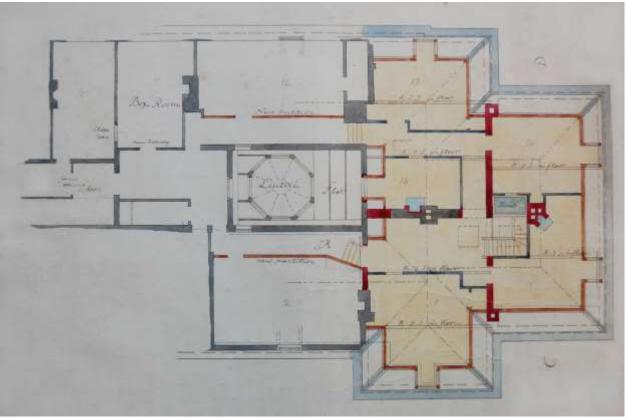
The 1899 Second floor plan © The National Archive, Kew
